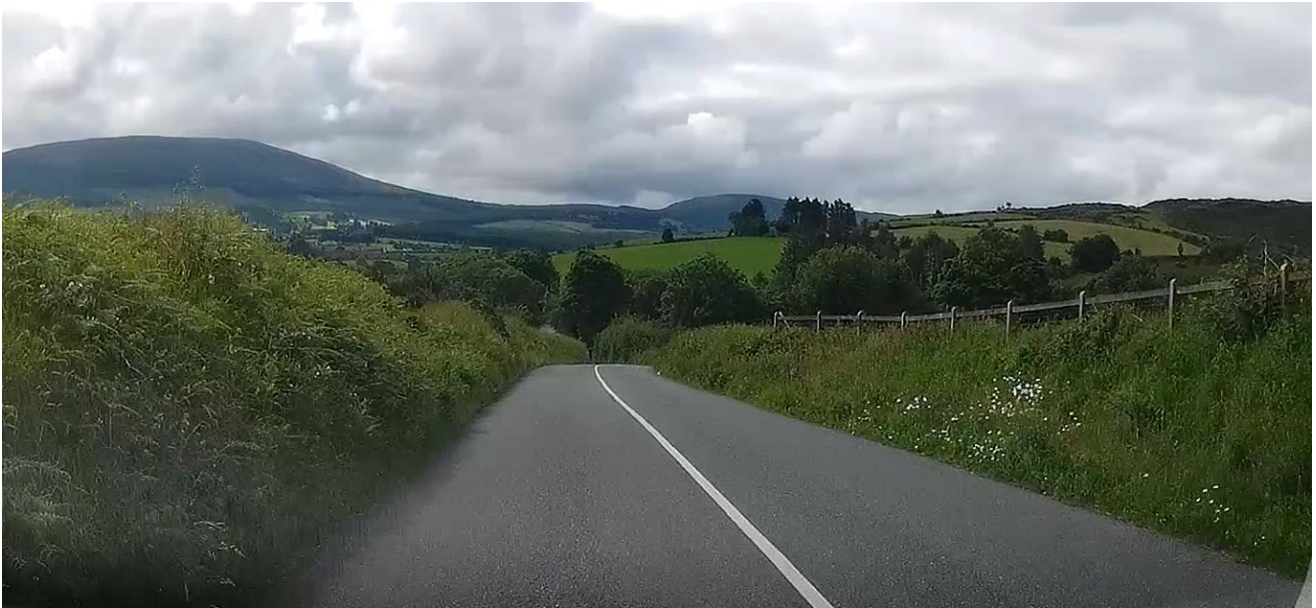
L2750/L1123 Butter Road Approaching Site From South (TDR)
